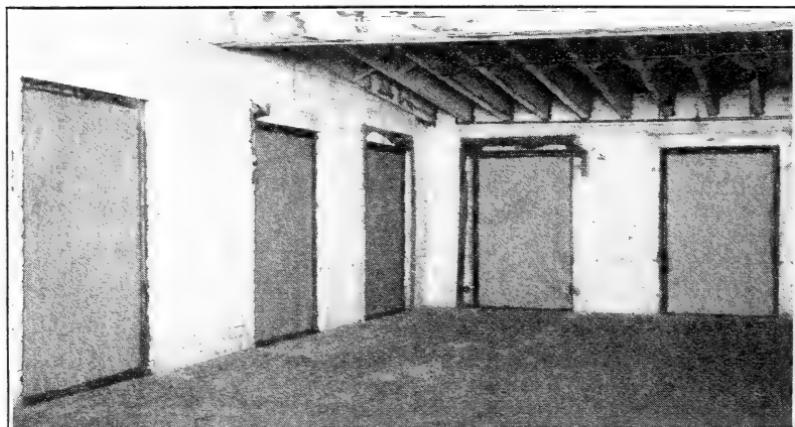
Windows sealed on the inside with paper. Cracks about unions of rafters and walls are sealed with plastic cement.
